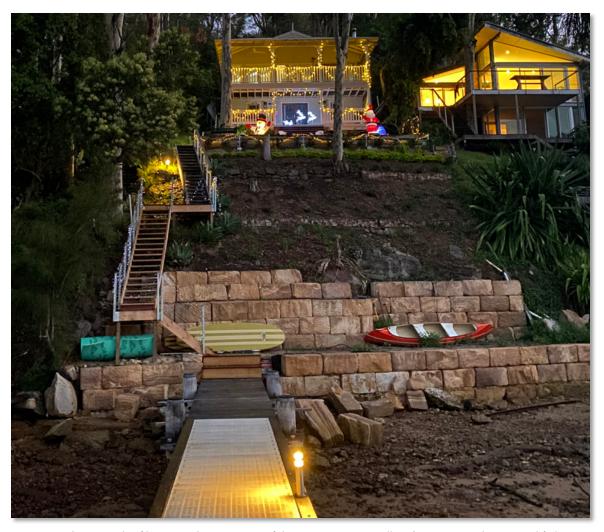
Photograph of lower and upper tiers of the sea retaining wall, (taken prior to the ground failure)
